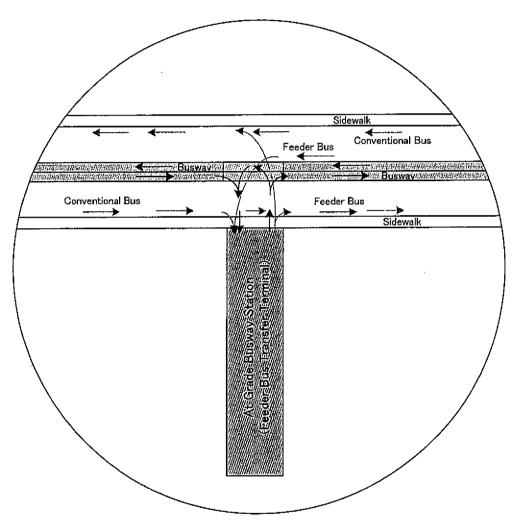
Conceptual Location of At Grade Busway Station in a Site on the Road
